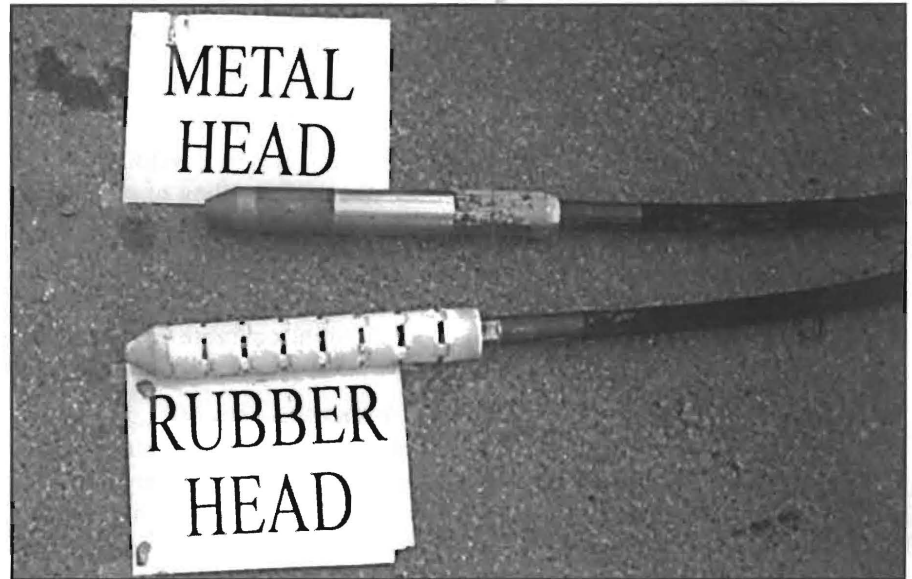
Rubber-headed vibrators cause less damage to epoxy-coated rebar.
